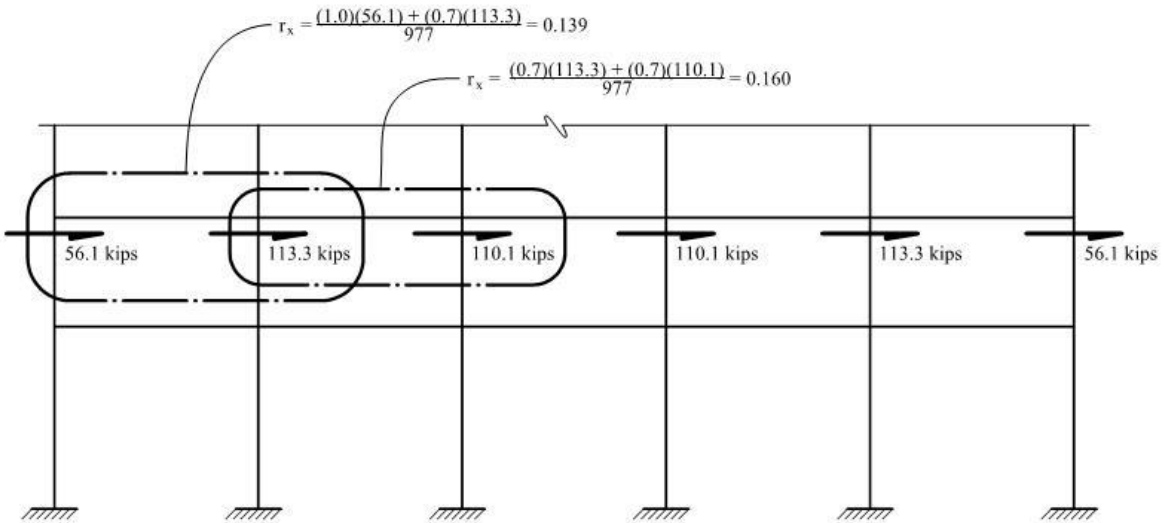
Column shears for N-S direction (partial elevation, Level 3) (1.0 kip = 4.45 kN).
